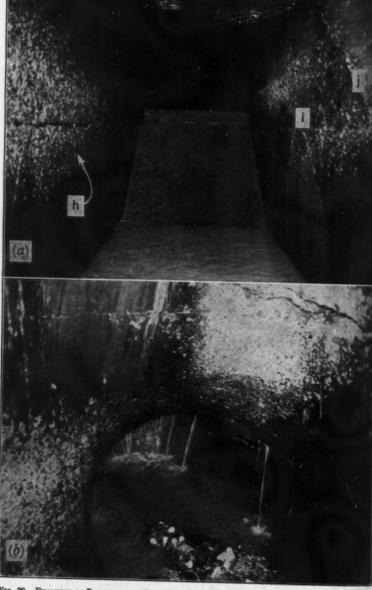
Examples of Pitting in the Lock-Filling Culvert of Wilson Dam: (a) Downstream from a Constriction in the Culvert (7 ft by 9 ft); and (b) Downstream from a Sharp Bend
